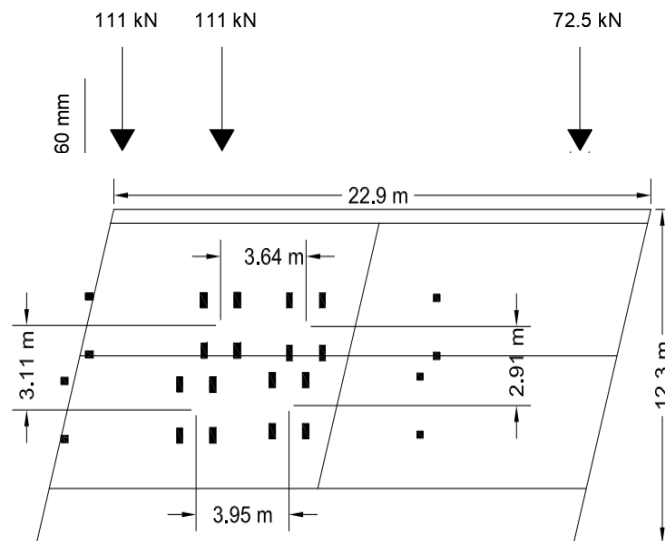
Typical Truck Dimensions and Wheel Weights for Shear Tests
